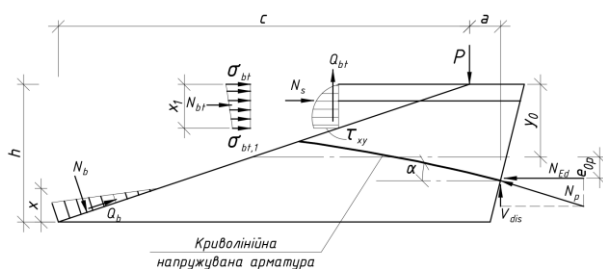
Calculated model of the limit state at the stage of formation of inclined cracks in elements with curved tensioned reinforcement without adhesion to concrete
